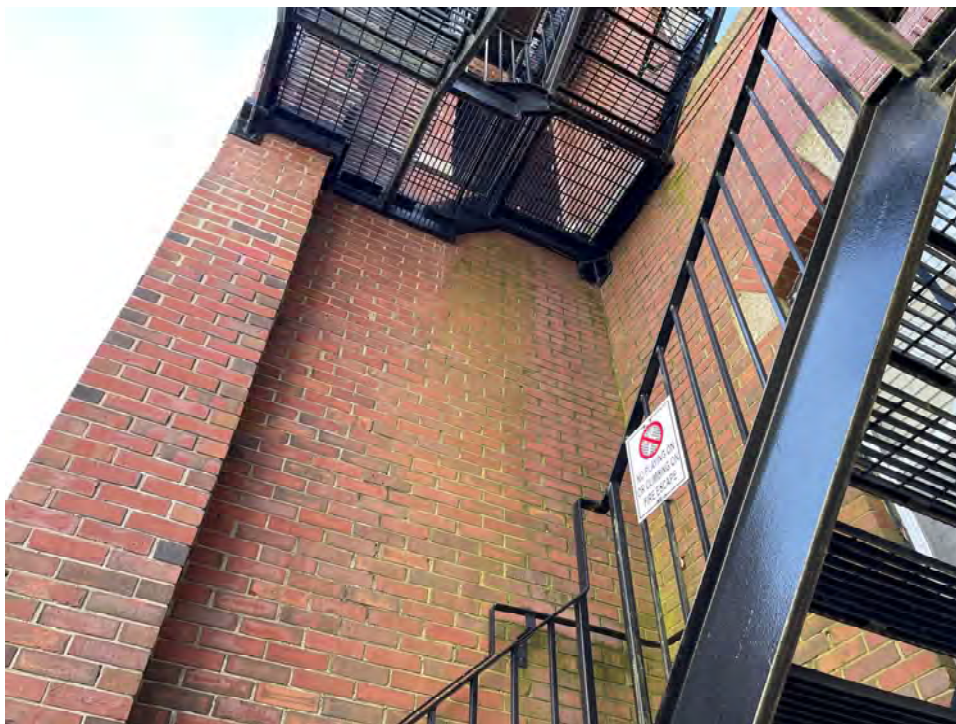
Overview of organics staining below fire escape stairs on north elevation Townsend Street entrance
